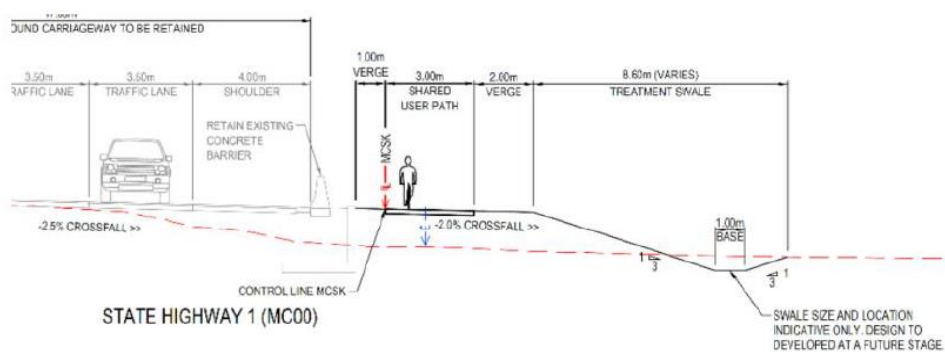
Typical cross section of State Highway 1 with a shared user path on the western side (Stage 2 Design Construction Report, section 3.1.2).
